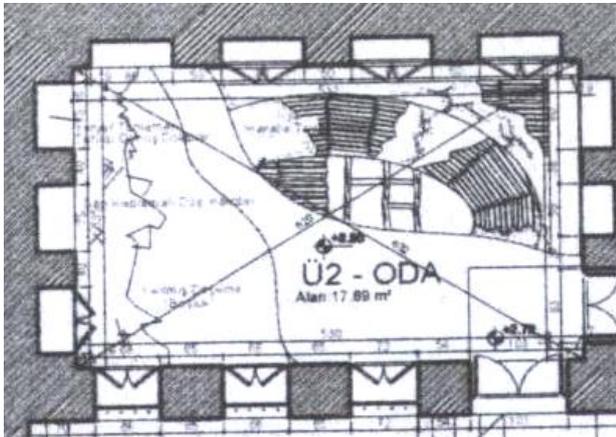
Detail from a Ceiling plan from province Gaziantep, Turkey
